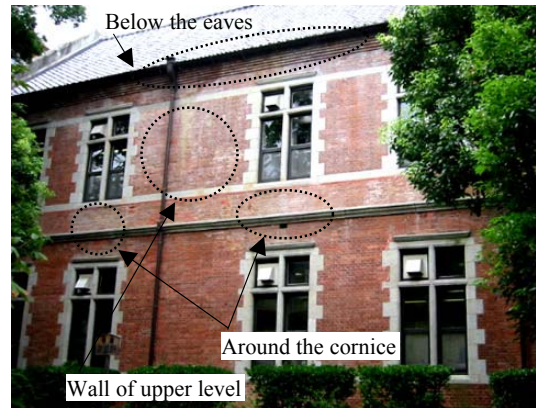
Efflorescence on a historical masonry building reinforced with concrete
